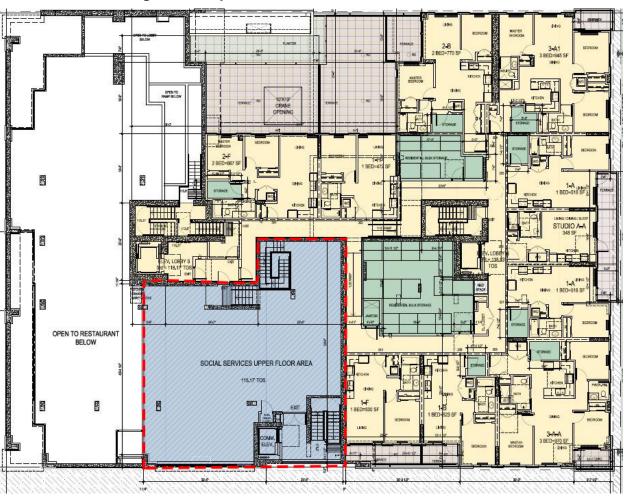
Proposed Mezzanine Shown on 3rd Floor Plan
